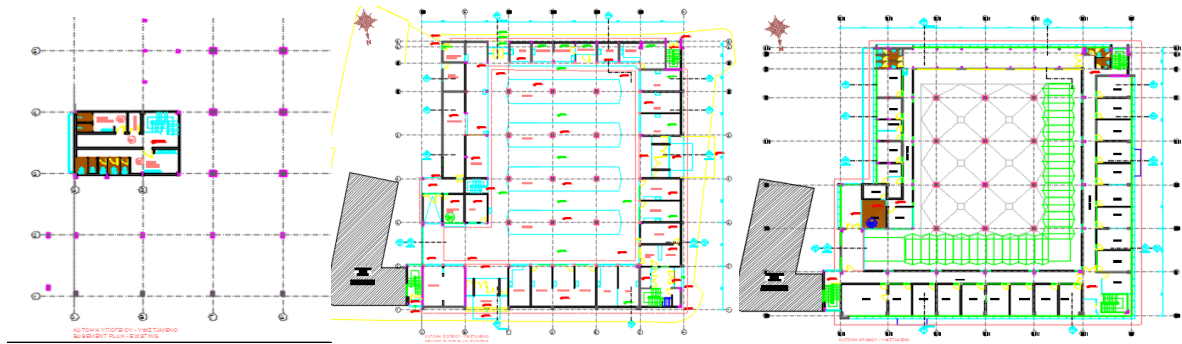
Plans of basement, ground floor and mezzanine, as recorded by Nicosia Municipality
